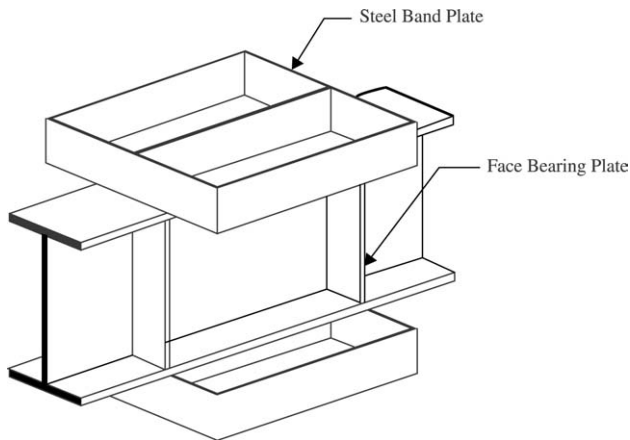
Two reinforcing techniques in the panel zone of the beam-through-type connections.
